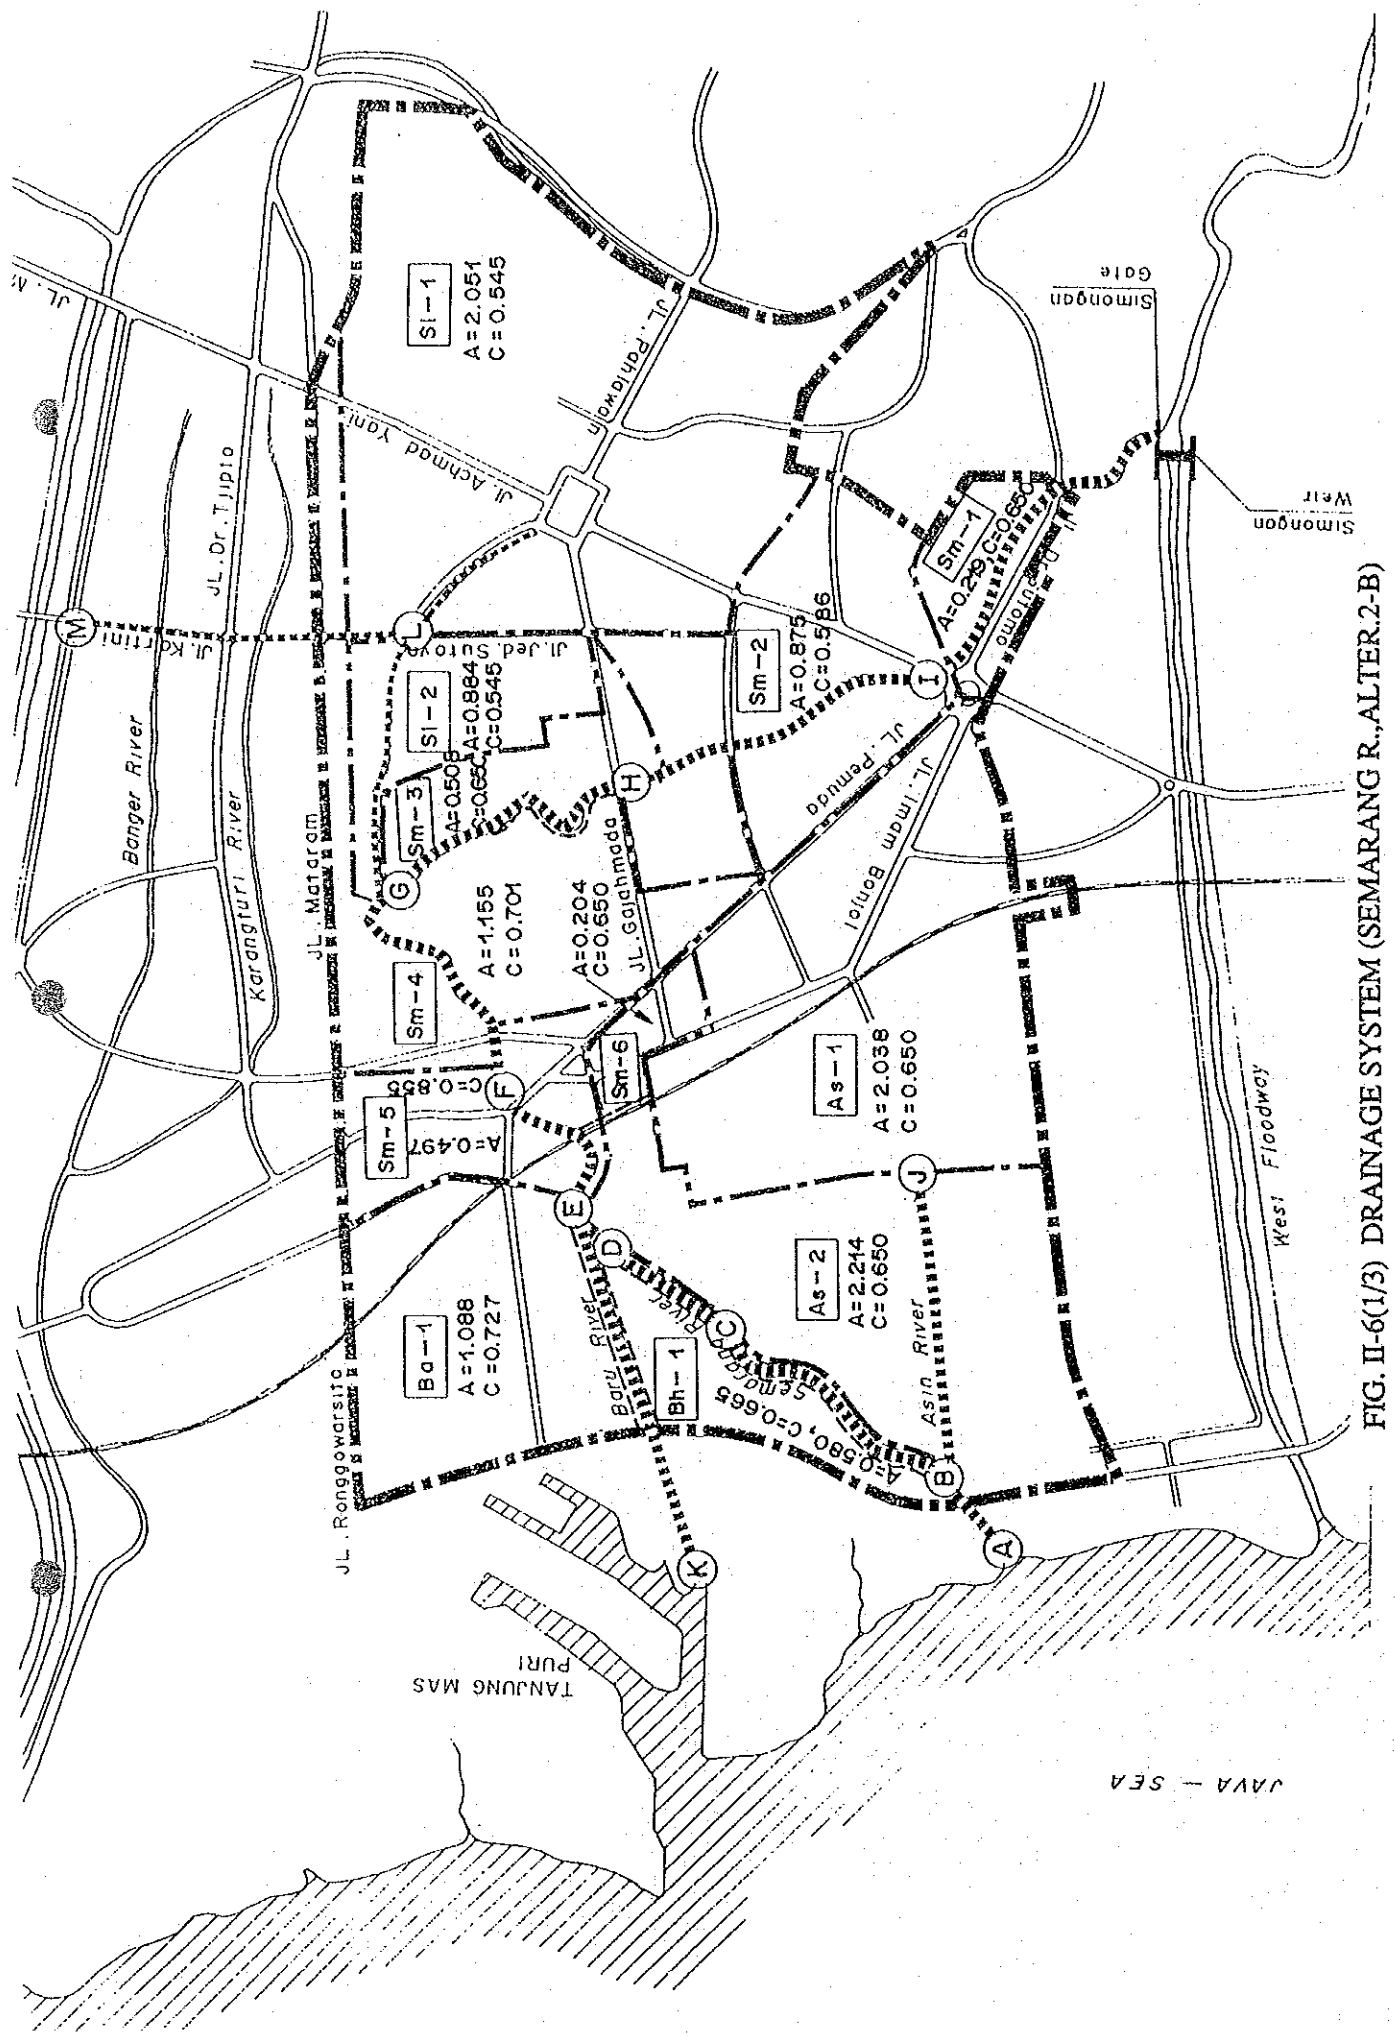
(1/3) DRAINAGE SYSTEM (SEMARANG R., ALTER. 2-B)
